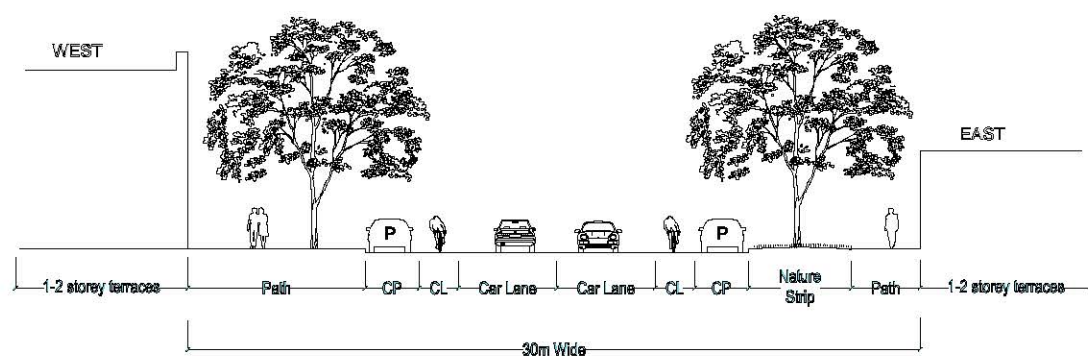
Indicative Adderley Street section between Rosslyn Street and Stanley Street looking north.
